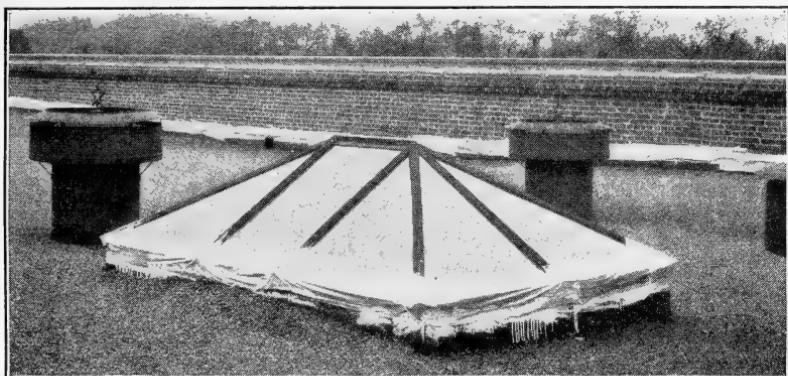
Skylights and flashings on roof sealed in preparation for fumigation.
